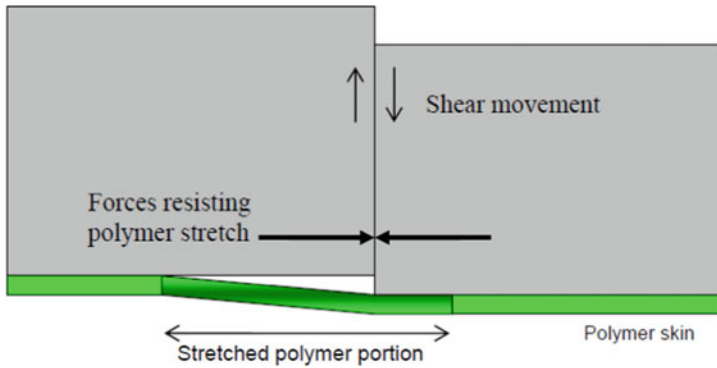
Shearing mechanism along the fracture surface [17]
